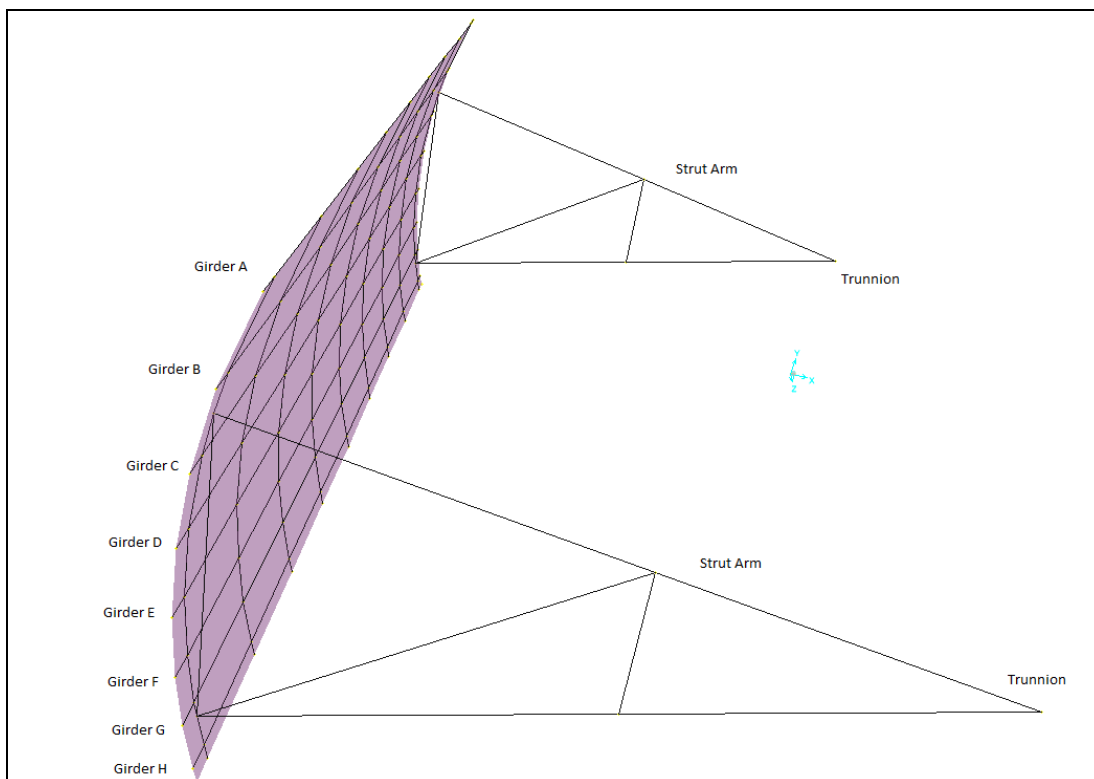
General Layout of New 30-by-12-Foot Tainter Gate
